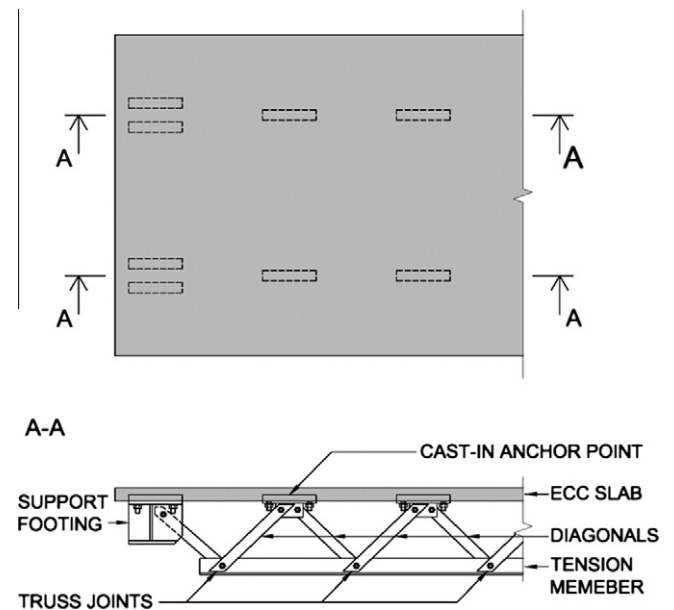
(a) Plan over-view of the modular deck, (b) longitudinal cross-section of truss structure connected to ECC deck panel.
